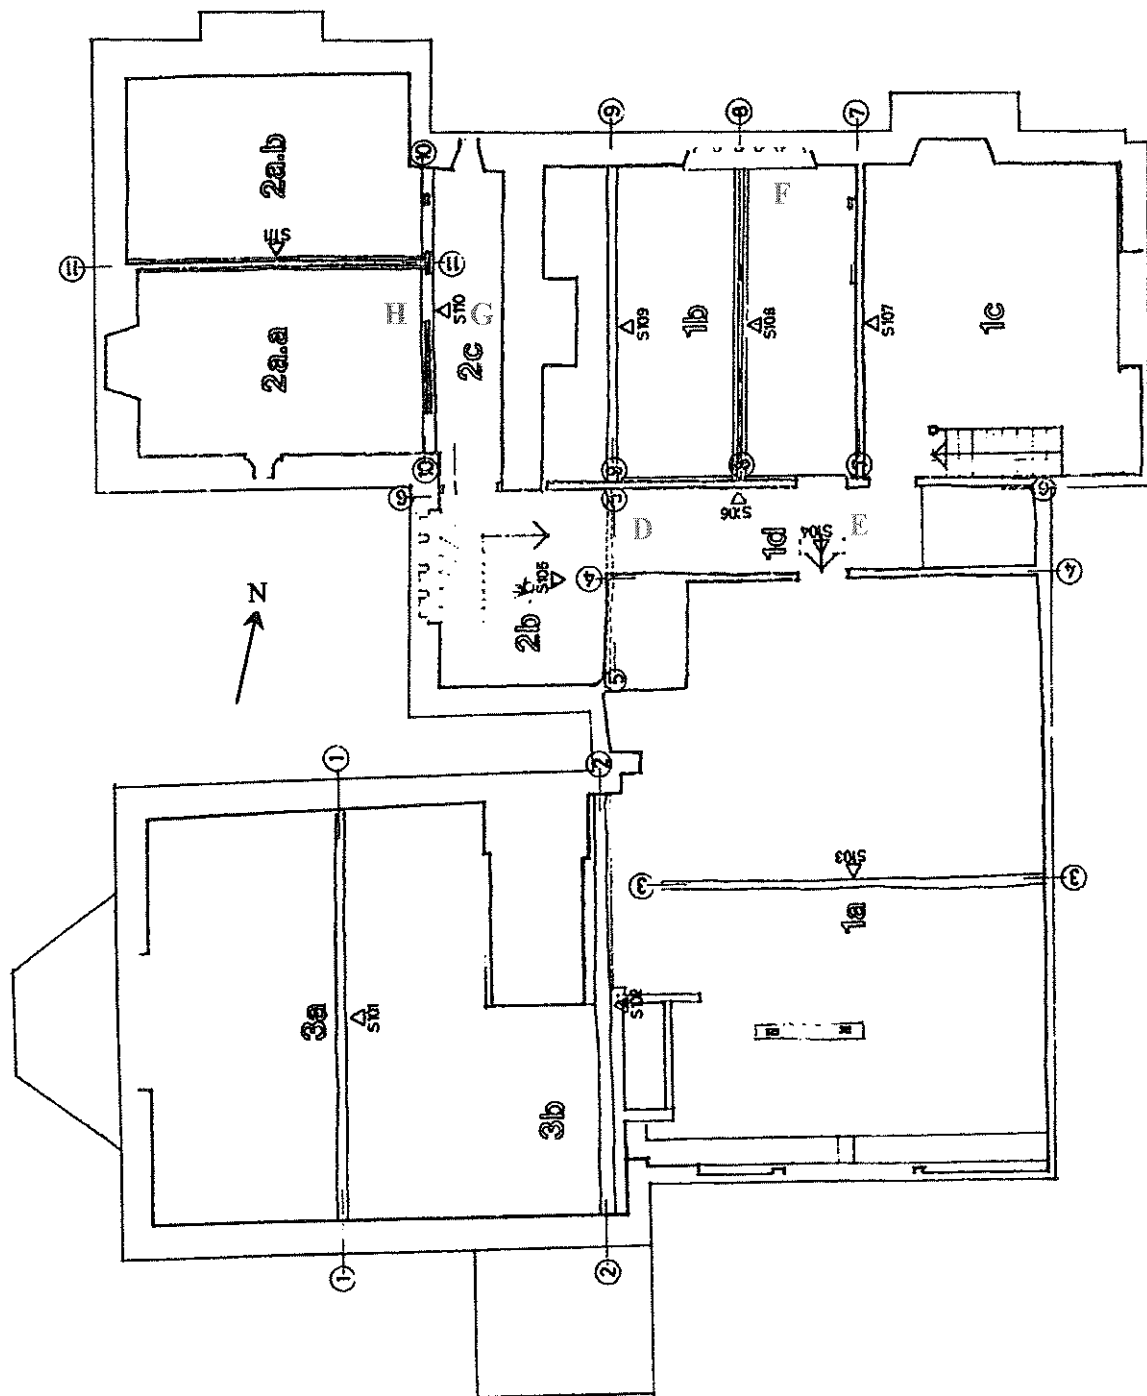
The ground floor plan of Hall I' Th' Wood showing the approximate location of core samples 112 and 113.
